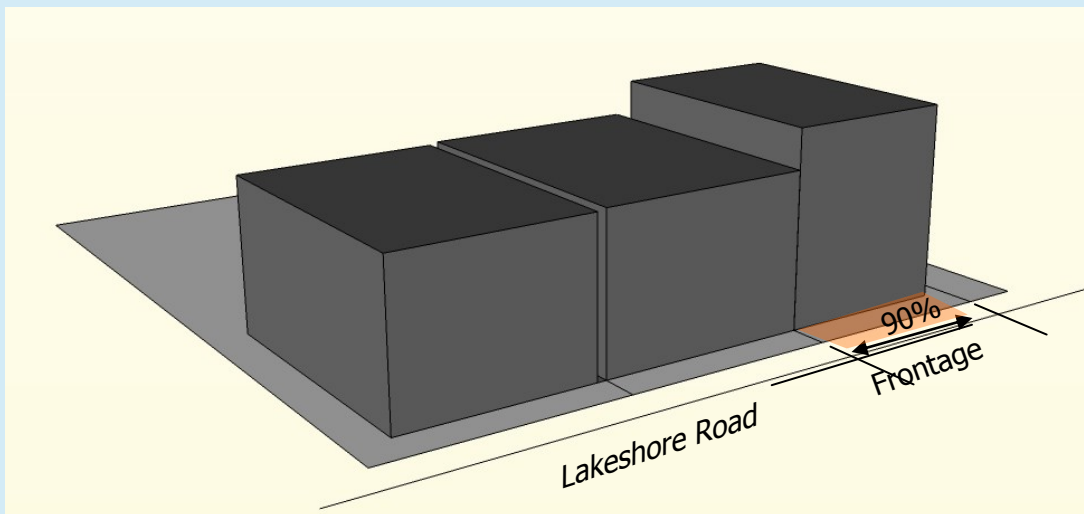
A minimum of 90% of the building shall front onto Lakeshore Road East and West and be within 0.0 m to 3.0 m
